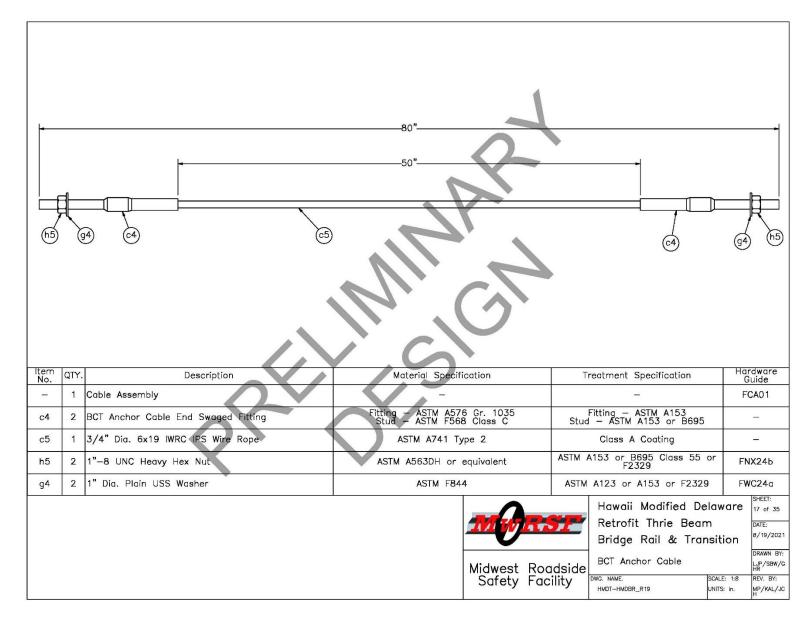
BCT Anchor Cable, Test No. HMDT-1
